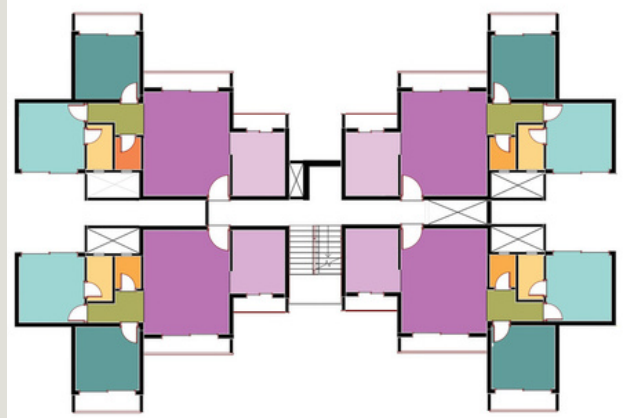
BUILDING 2 PLAN - 2 BHK
